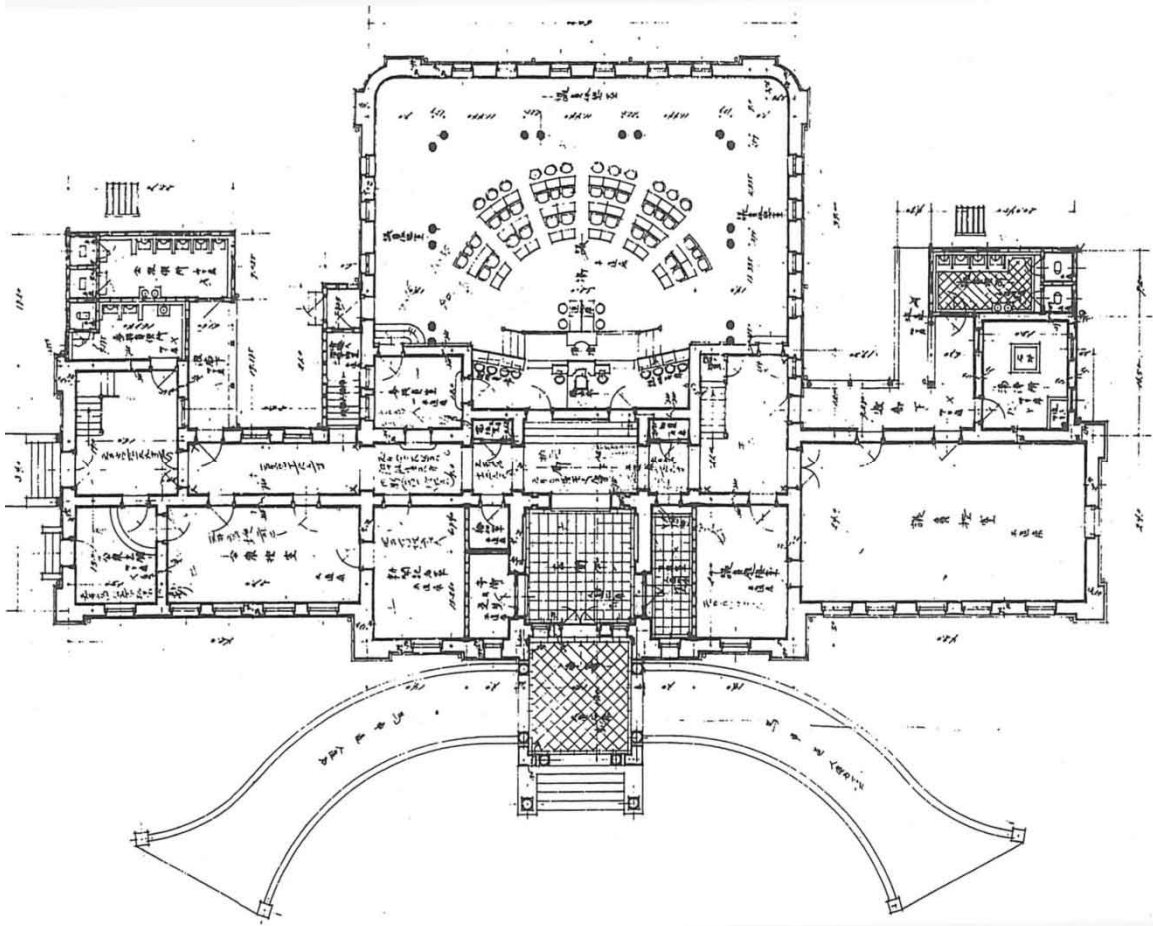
Plan of first floor in 1916, when the Assembly Building was constructed
